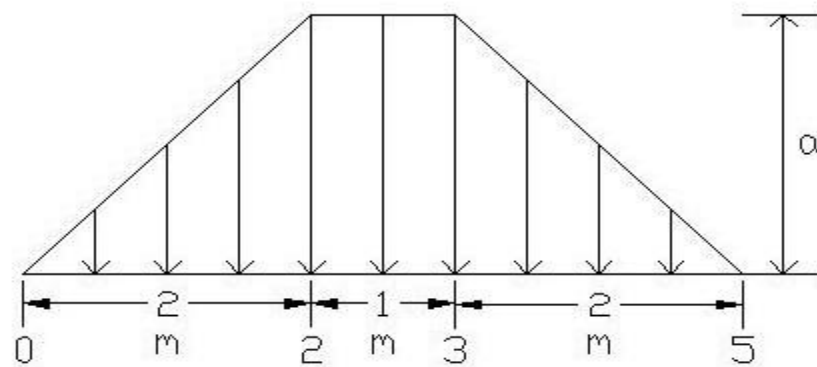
Trapezoidal loading with shorter span length of slab 4 m
